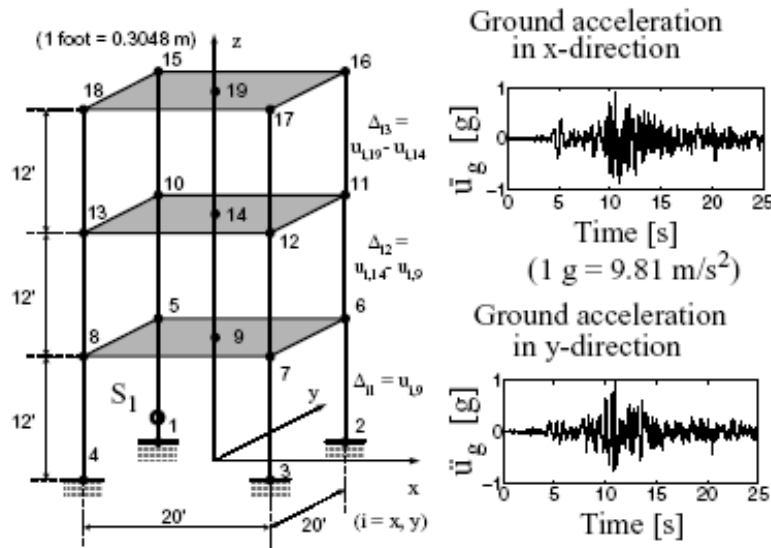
3-D one-bay three-story reinforced concrete building: structural model and input ground motion
